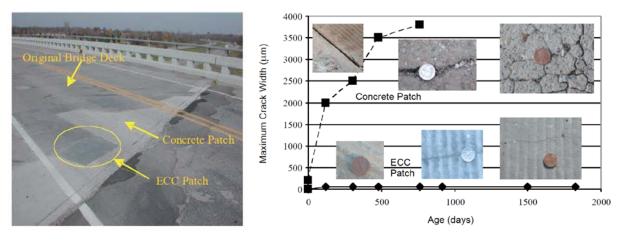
Comparison of ECC and concrete patches for pavement repair at Ann Arbor Michigan (Li 2008)
